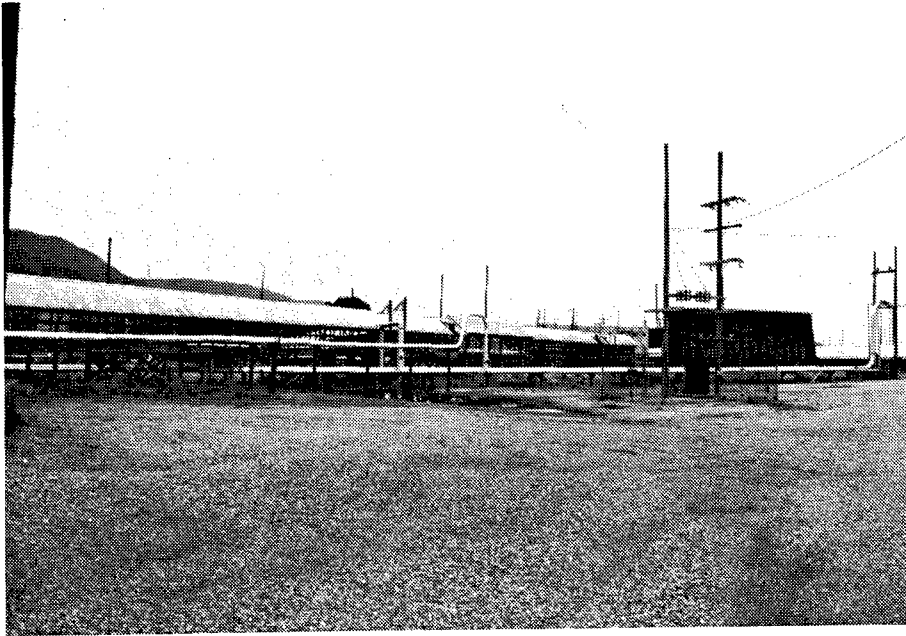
Covered and elevated TNT Catwalk behind Building J3.
